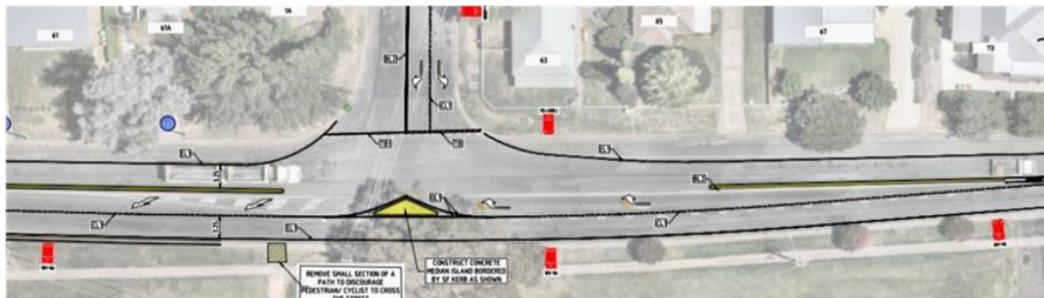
The proposed seagull type intersection at the intersection of Woodward Street and Racecourse Road.
